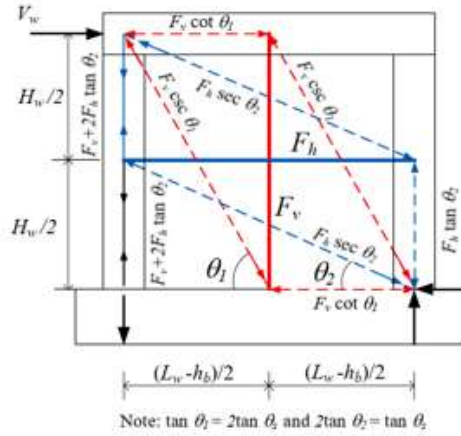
2: Truss Mechanism for Reinforcement Contribution
